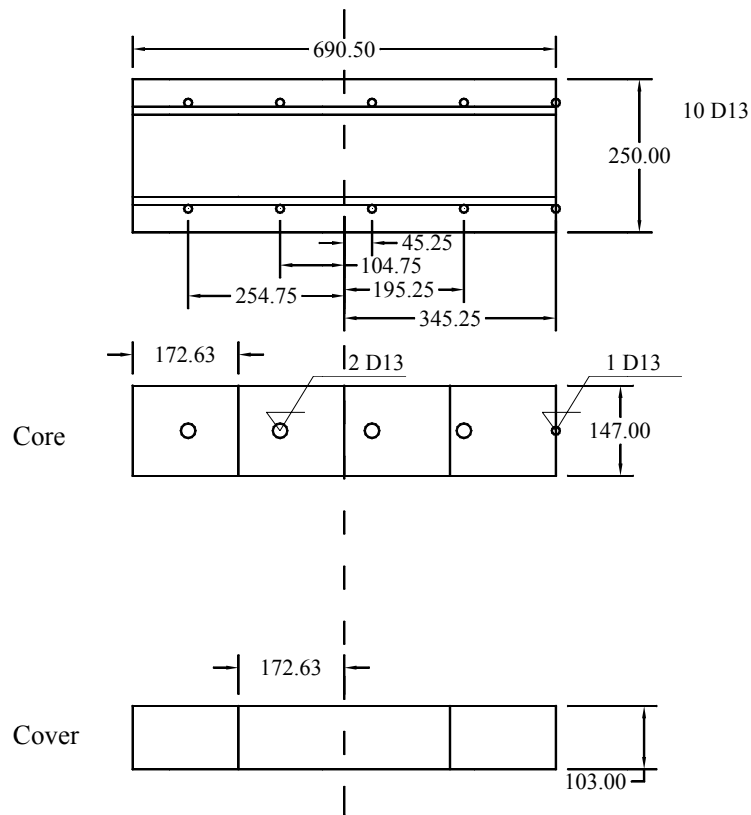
First-story mid-section element cross section (Units: mm)
